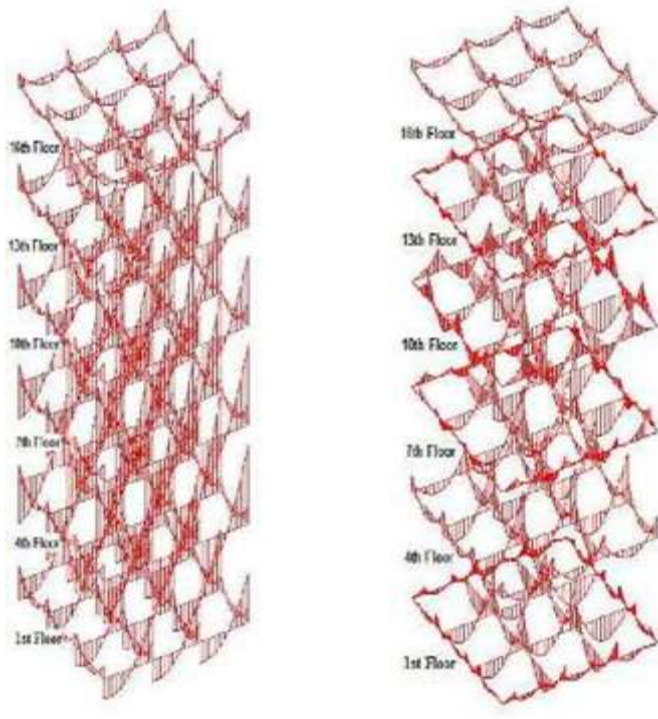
Bending moment diagram of selected floor beams for conventional and diagrid building (Conventional building & Diagrid building)
